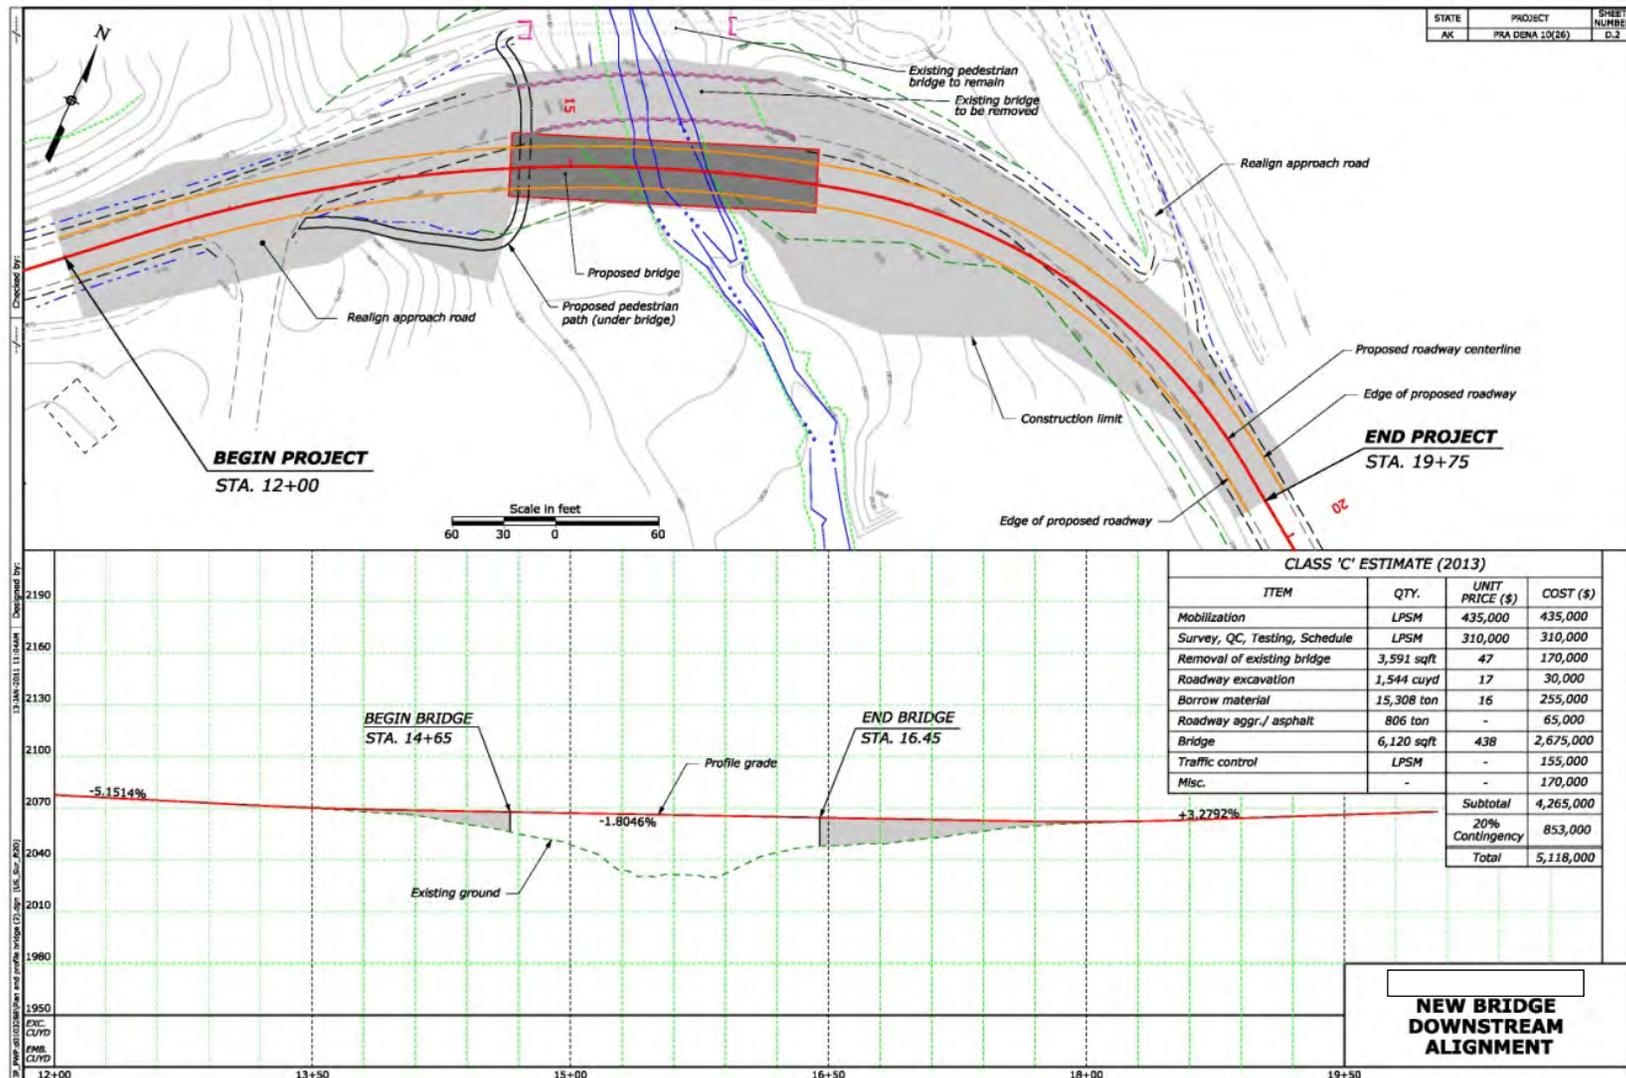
Alternative 4: New Bridge, Downstream Alignment.
